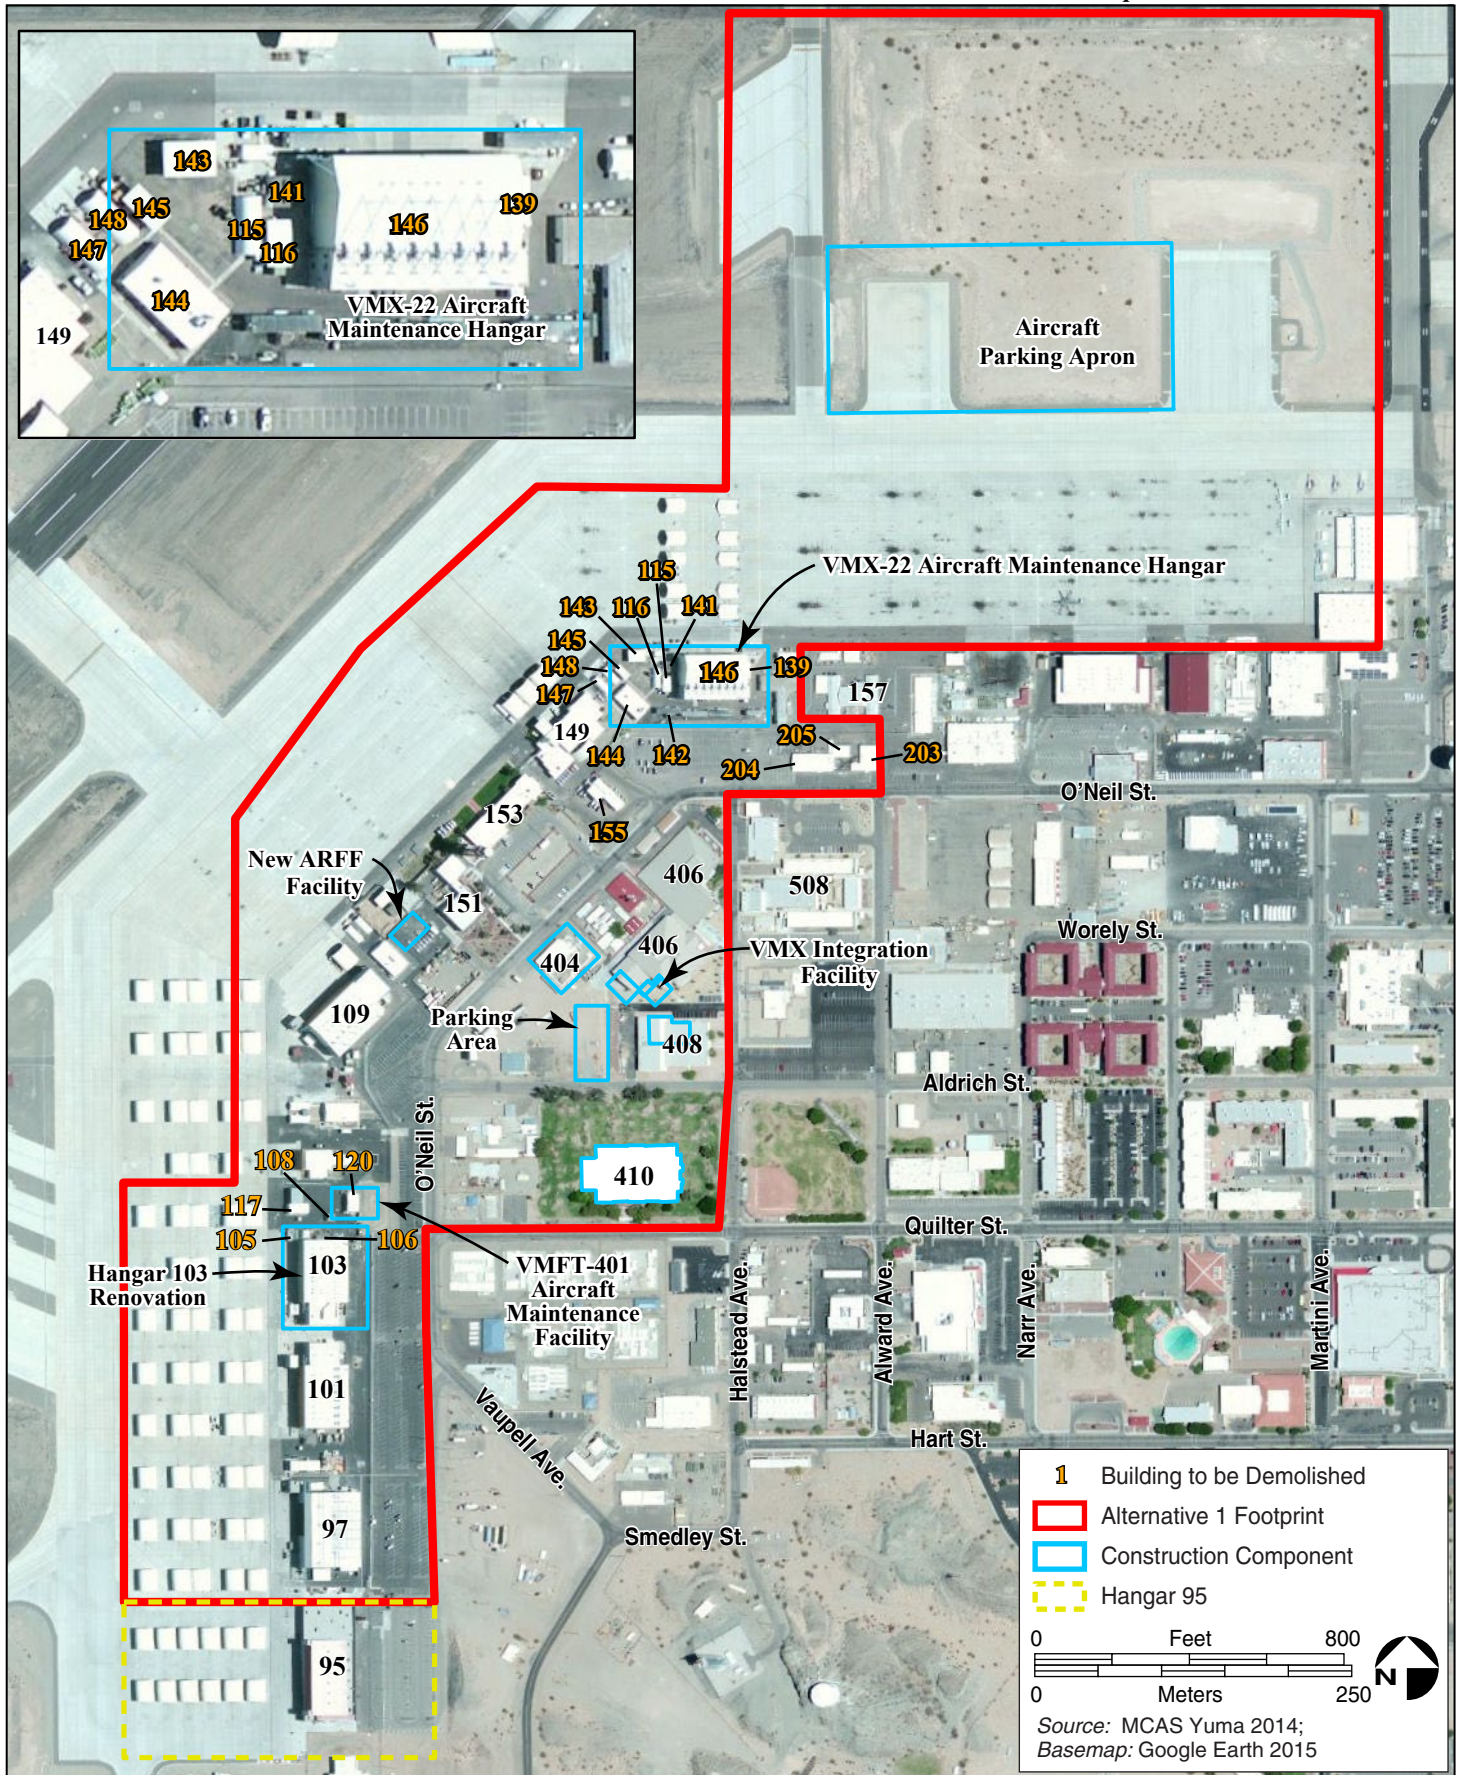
Alternative 1 Conceptual Site Layout
